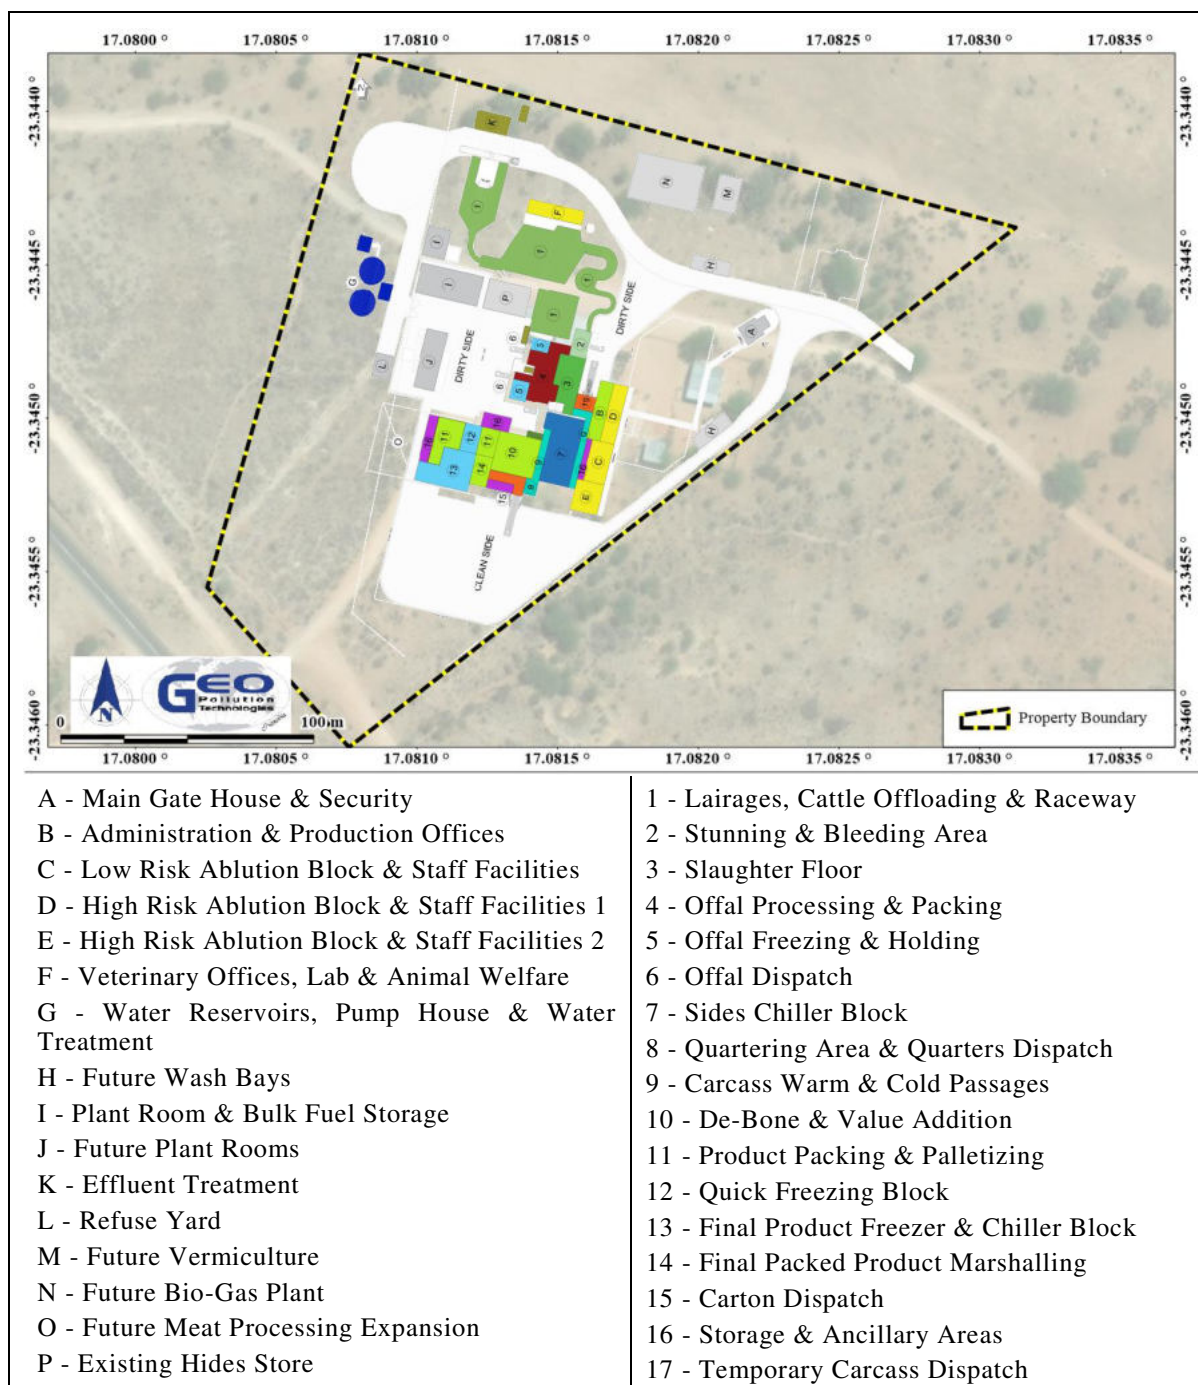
Proposed site layout (Burmeister and Partners Consulting Engineers 2022)
